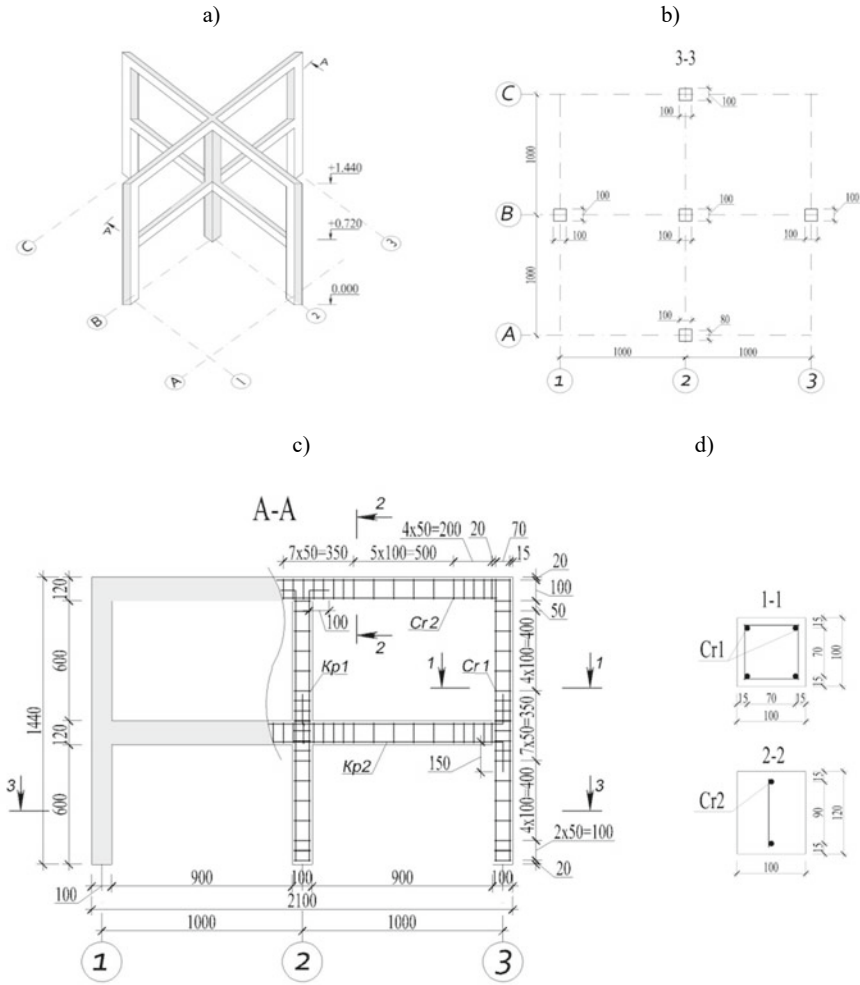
General view of a spatial two-story reinforced concrete monolithic frame (a); the layout of the frame columns (section 3-3) (b); formwork drawing and space frame reinforcement along the B (c) axis; sections 1-1, 2-2 racks and crossbars of the frame (d)
